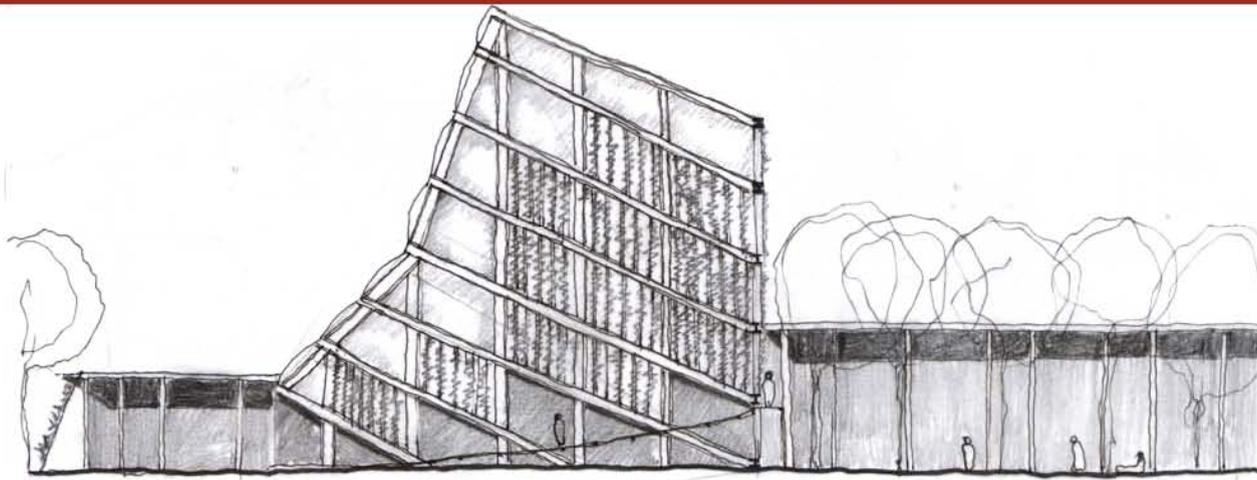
Elevation: Stacked greenhouse idea - June 2008
